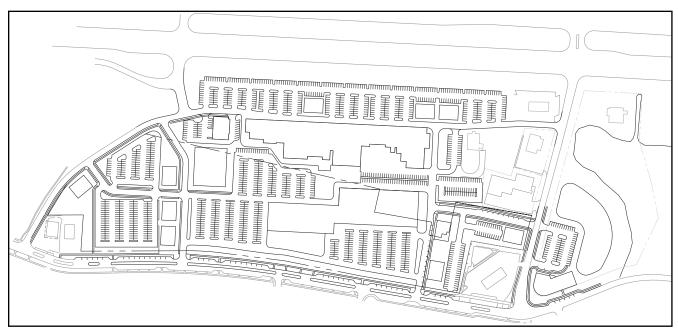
Alternative Site Layout A - Site Layout without a PUD ordinance
